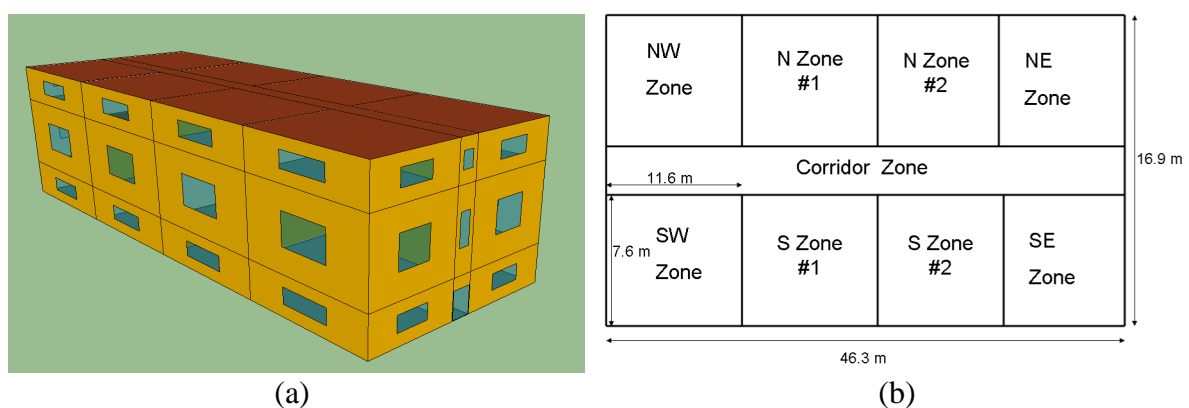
(a) 3D model (b) Floor plan of mid-rise apartment
